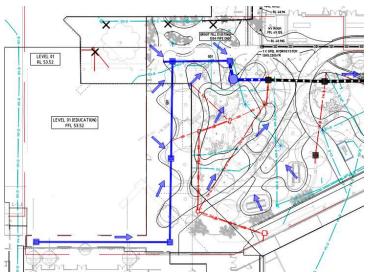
I: Connection of stormwater pipeline to Stage 1 System
